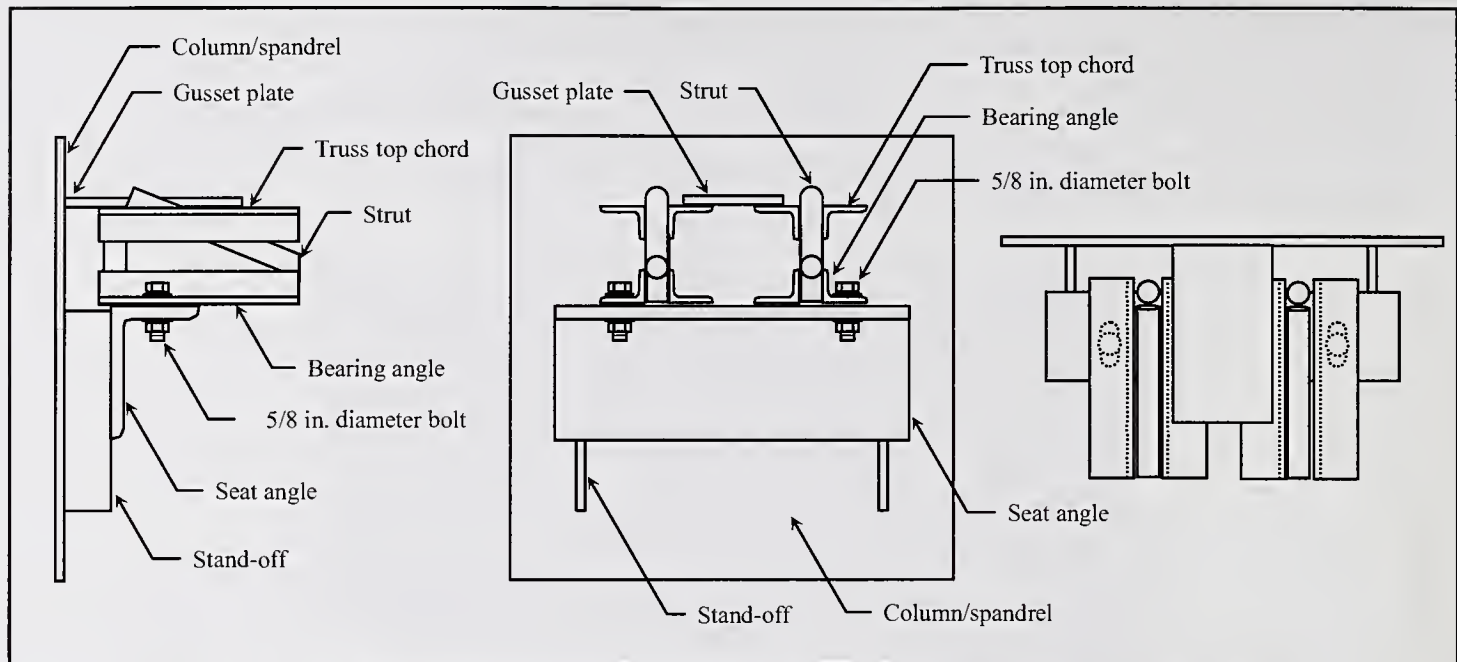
Exterior connection of the floor truss to the spandrel plate.
